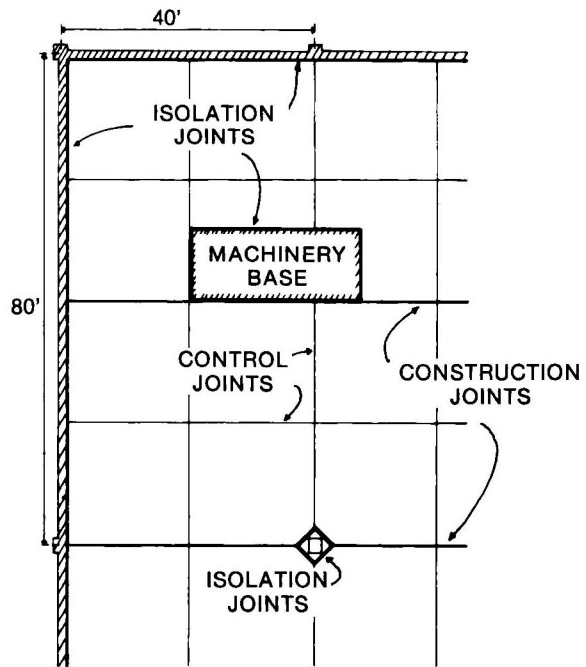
Typical joint layout for concrete floor on ground with no reinforcement.
